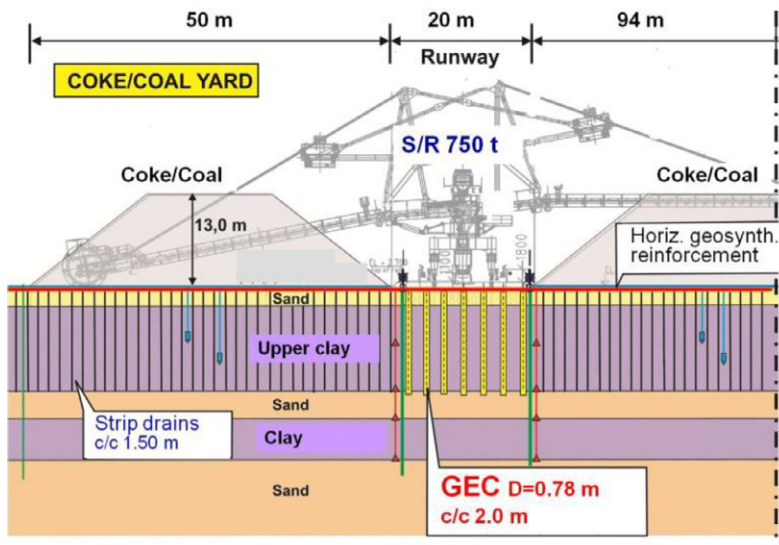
TKCSA steel plant: typical cross section (partial view).
